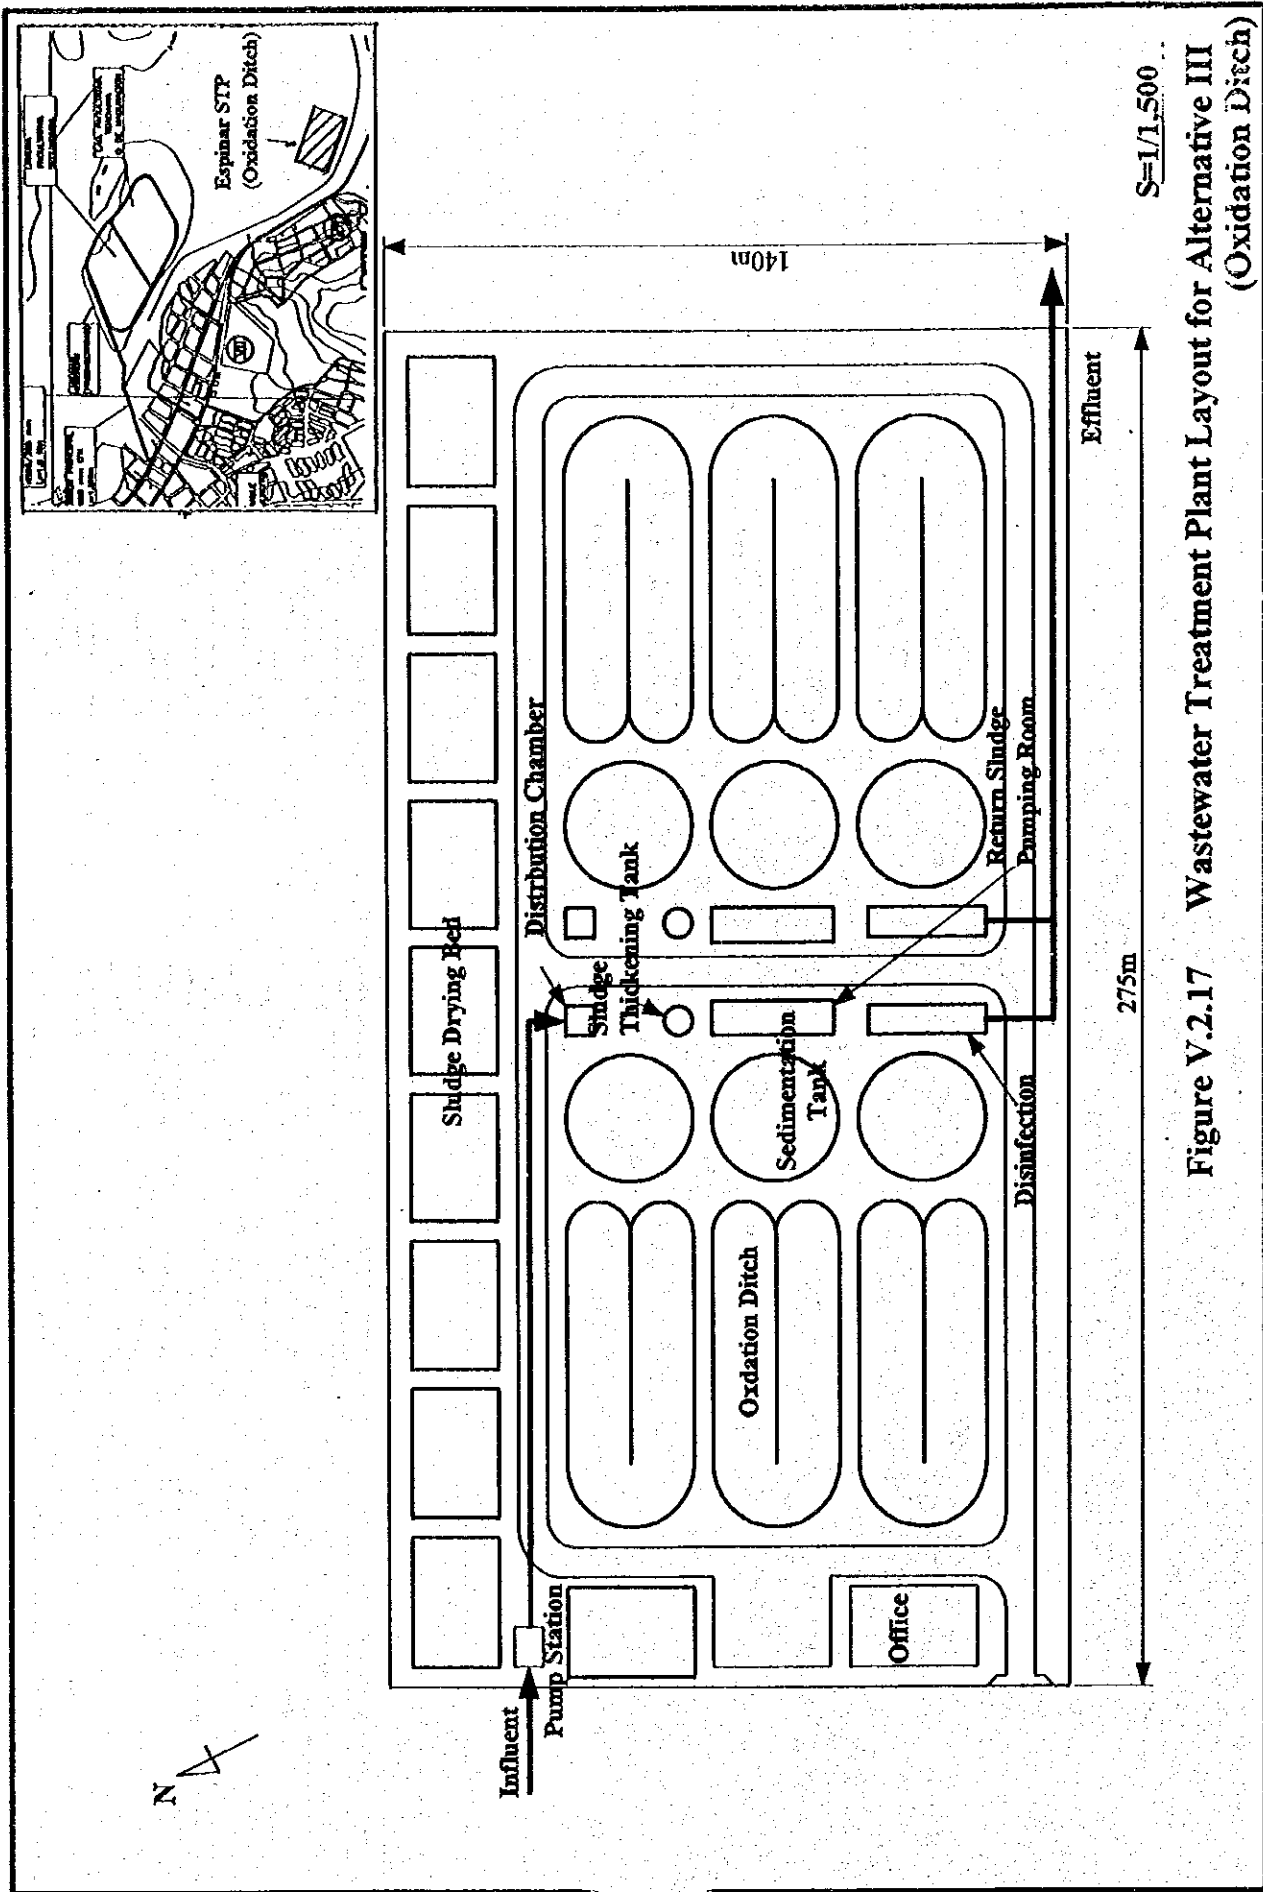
Wastewater Treatment Plant Layout for Alternative III (Oxidation Ditch)
